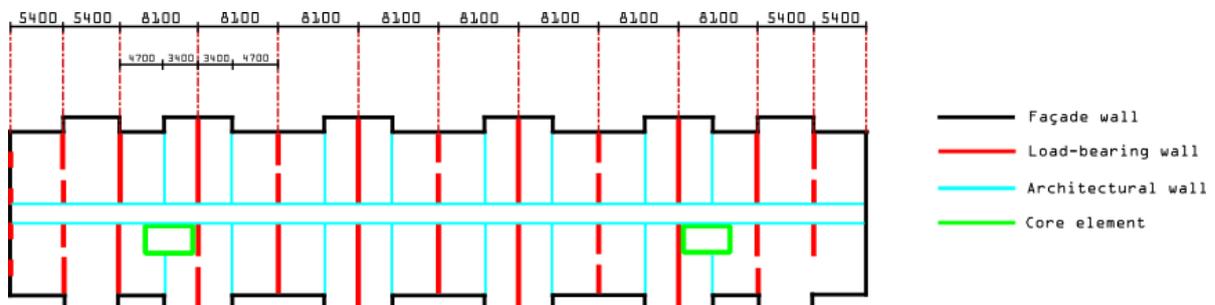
Floor Plan KasseNova aan de Vaart - Third Floor
